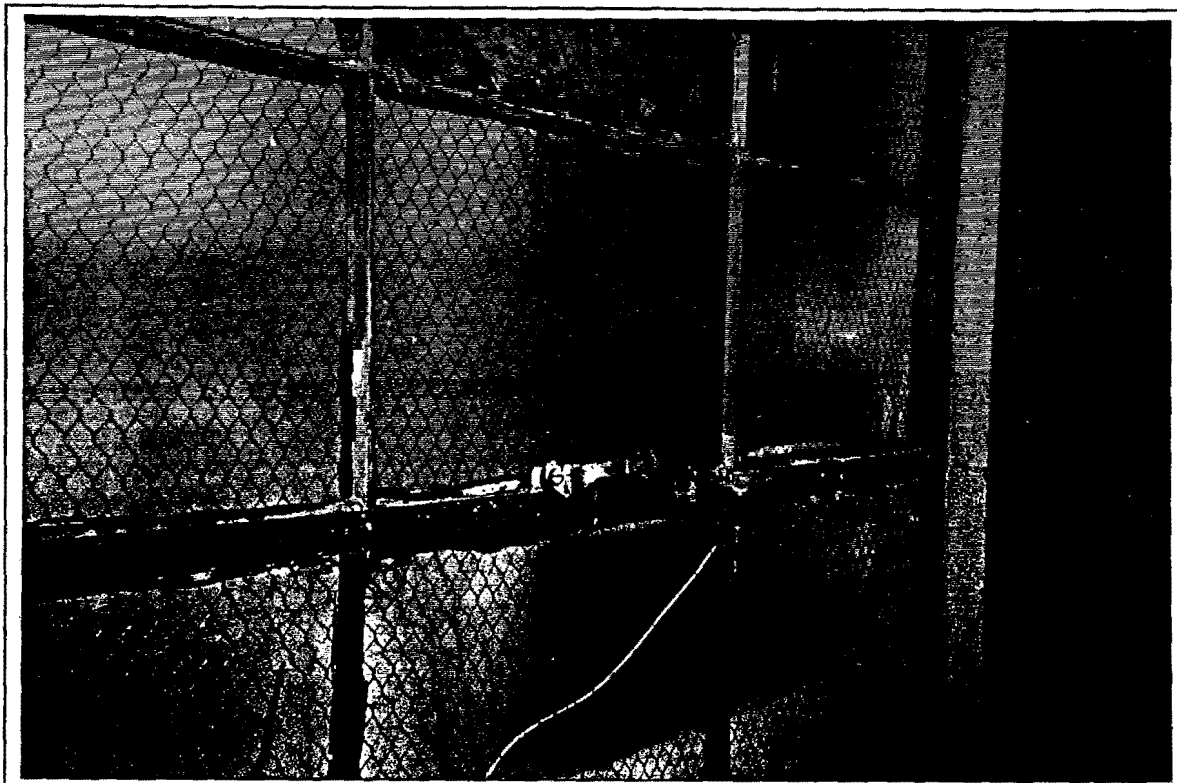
Building 5 - North side window where Sample No. 1-054 was taken. Sample analyzed negative for asbestos.
